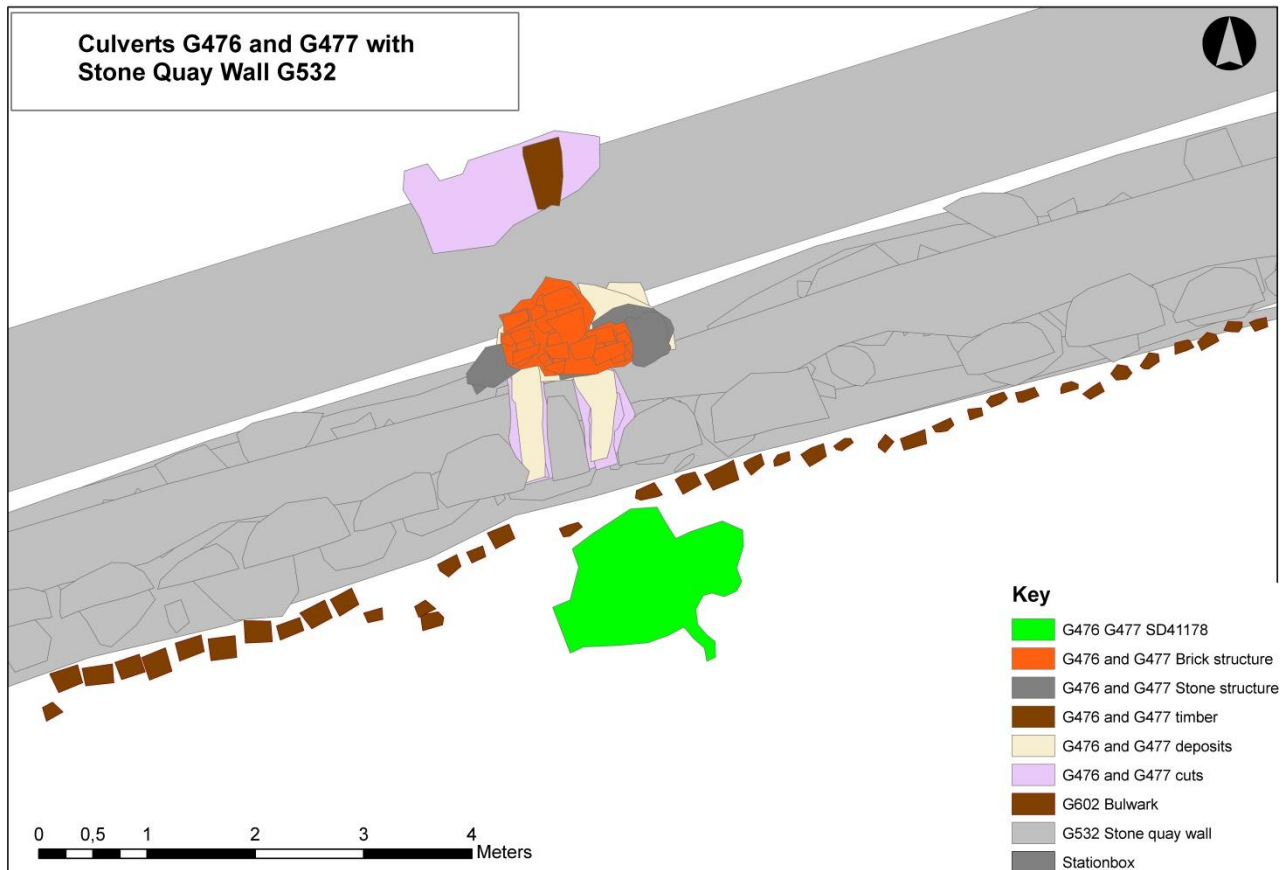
Plan of culverts G476 and G477 set within wall G532.
